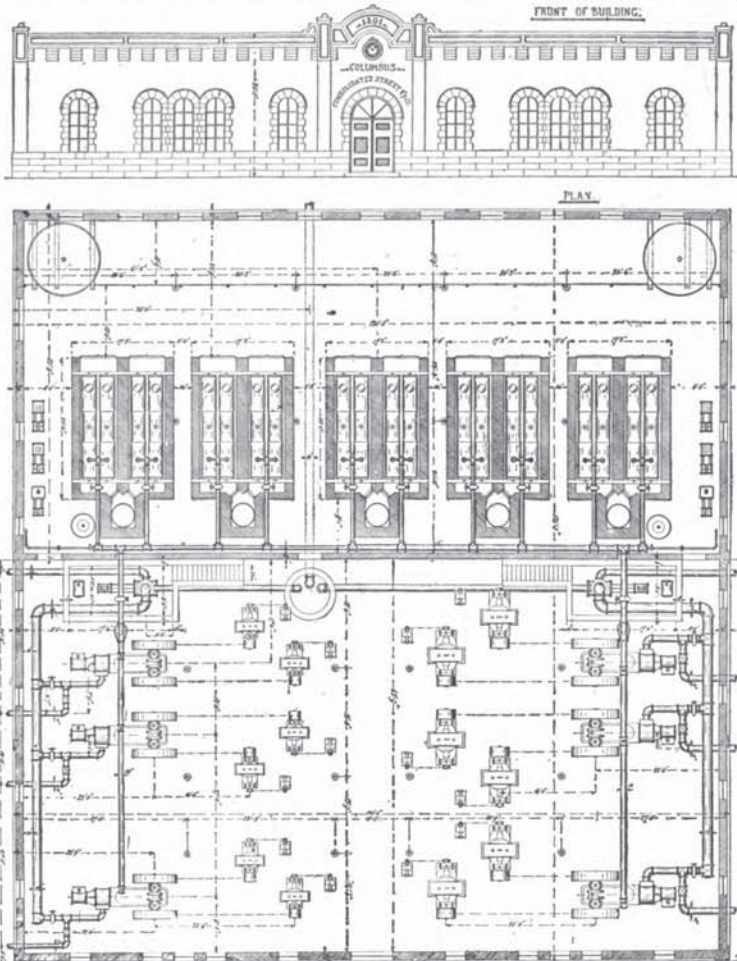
ORIGINAL PLANS FOR COLUMBUS, O., CONSOLIDATED STREET RAILWAY POWER STATION.
